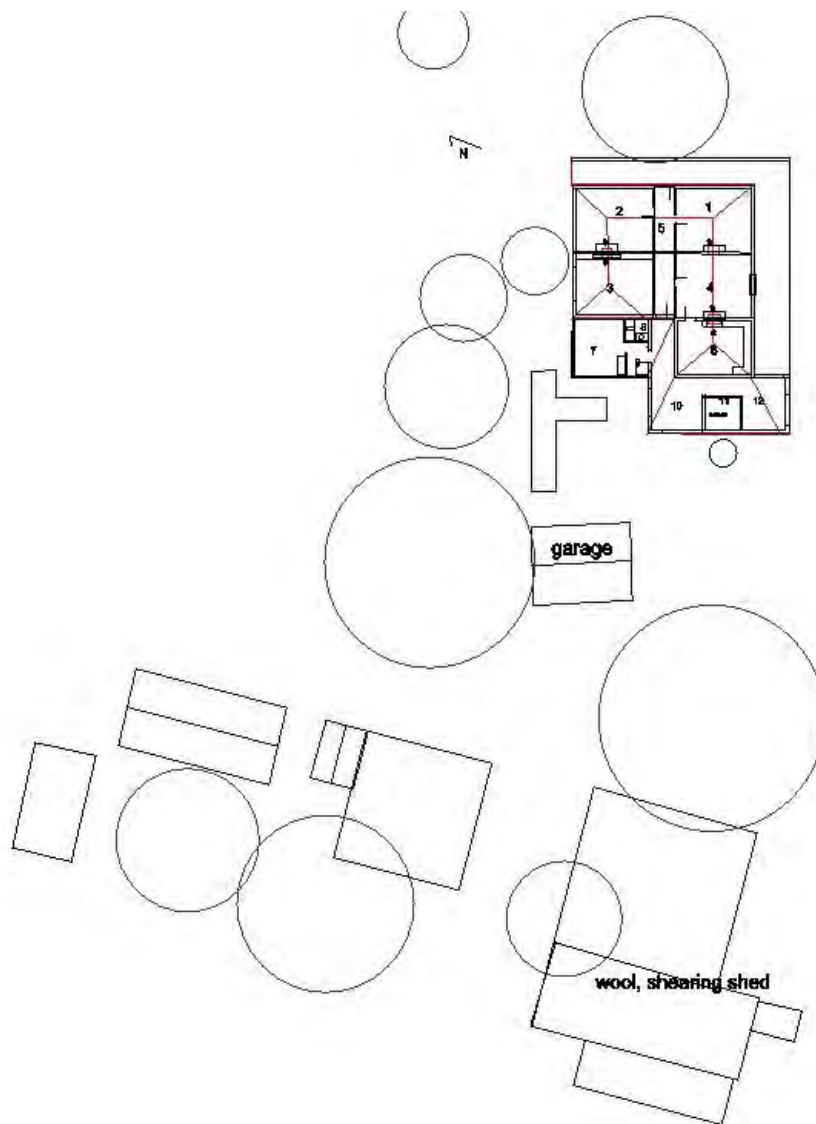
Kerr Farmhouse Complex Site Plan (Butler 2020)
